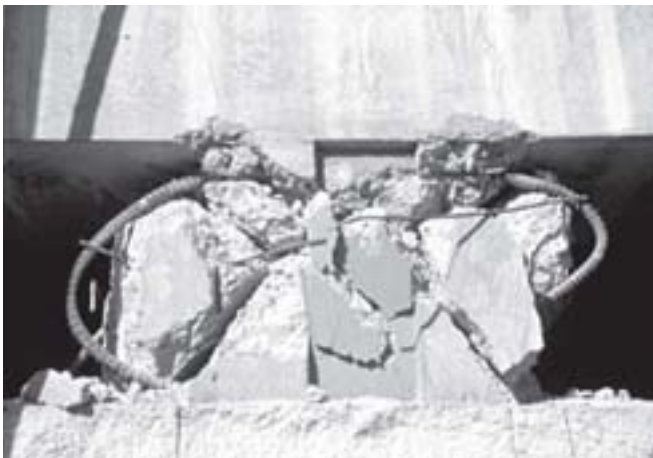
Short columns in this parking structure failed in the 1994 Northridge earthquake. Modern building codes now require much more reinforcing steel for such short columns.
